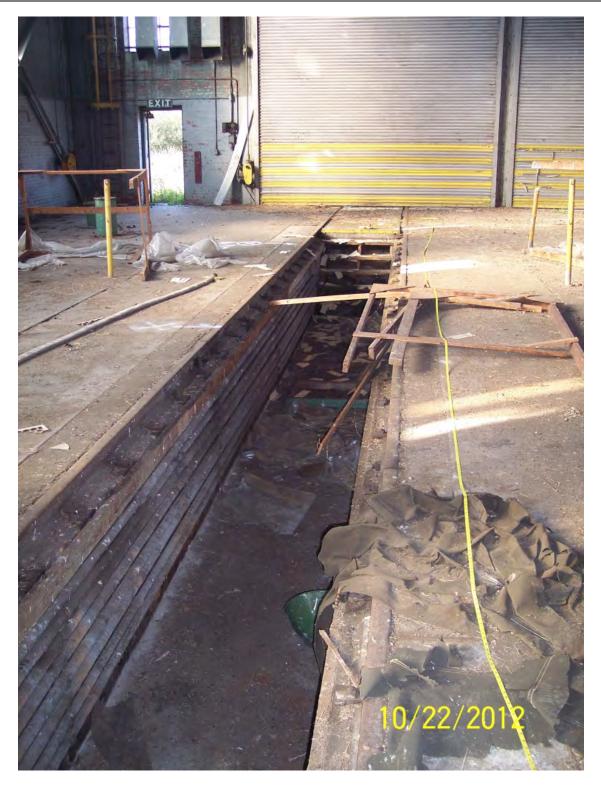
(2012): The view is looking north at the interior repair pit (DU04) within Building 47-40.
